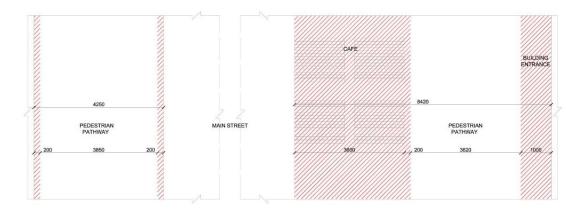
Street width and buffer spaces (in mm) for Gateway 8 in the area surrounding Hauptwache in Frankfurt am Main
